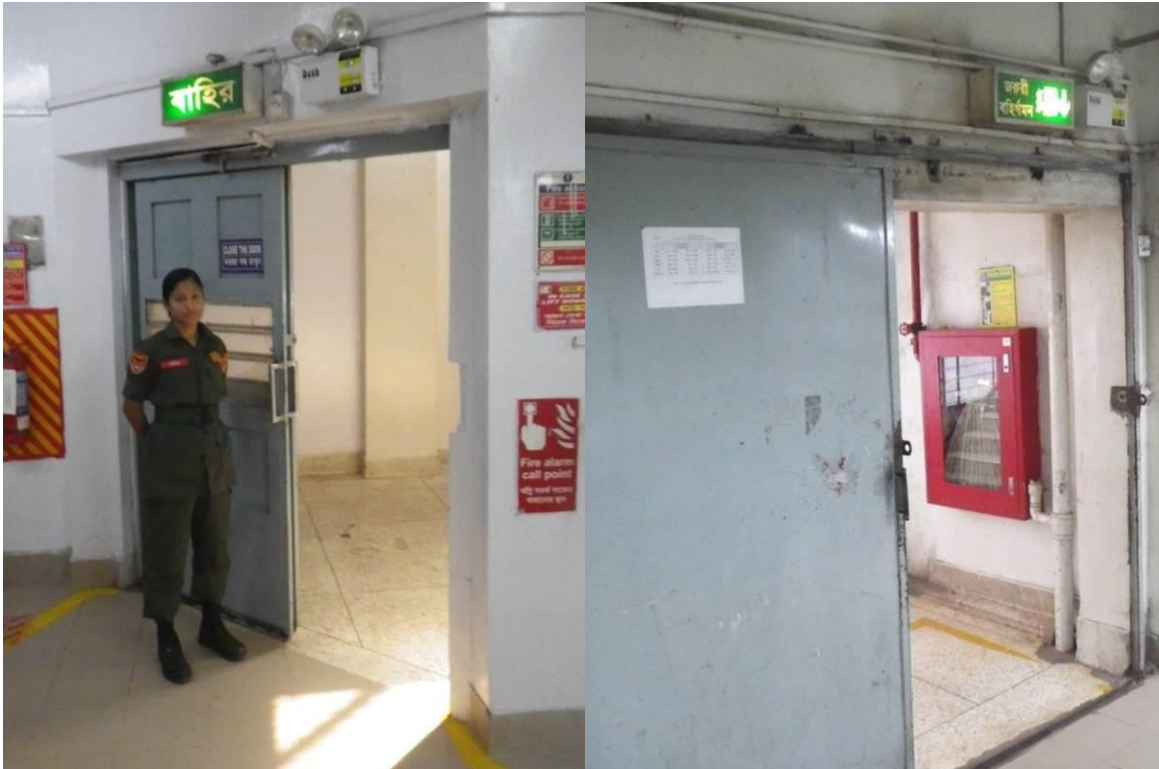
Non-rated, sliding exit stair doors (GMT-1)
